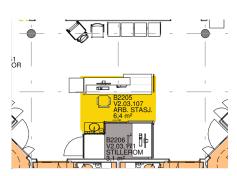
Vesterålen hospital work station. Photo: Svein Erik Tøien - www.setoien.com, plan
